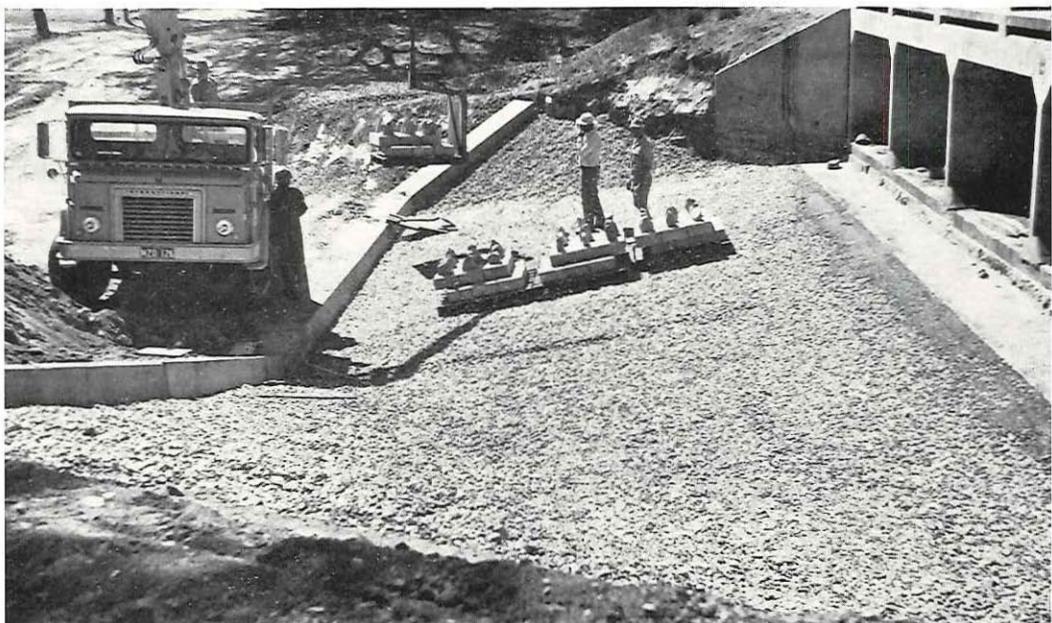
Filter layer spread level with top of upstream cap. The design of the precast concrete dissipator blocks to facilitate interlocking may be seen.
